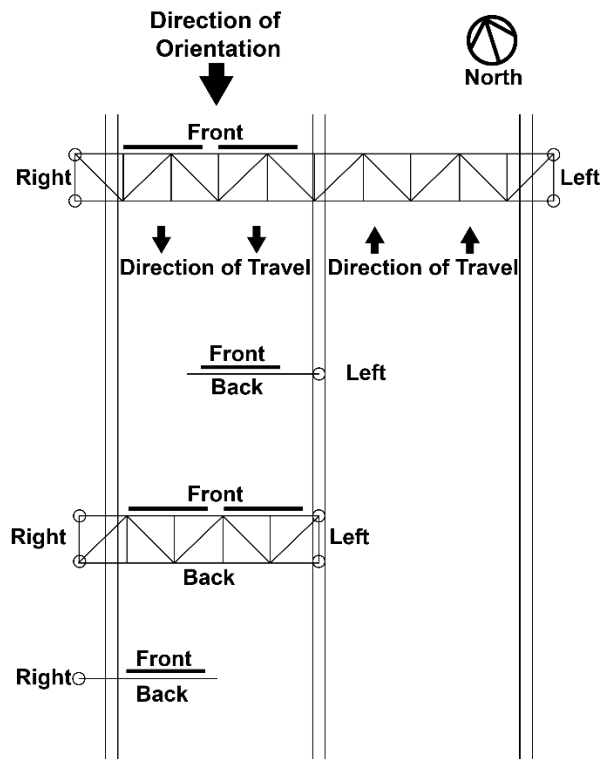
Illustration. Structure orientation examples with sign panels facing only one direction of travel.
